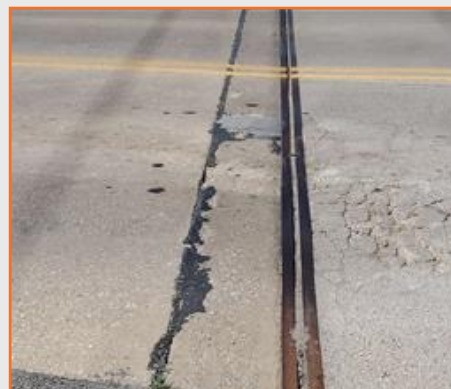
DNT bridge deck deterioration at Northaven Rd.
